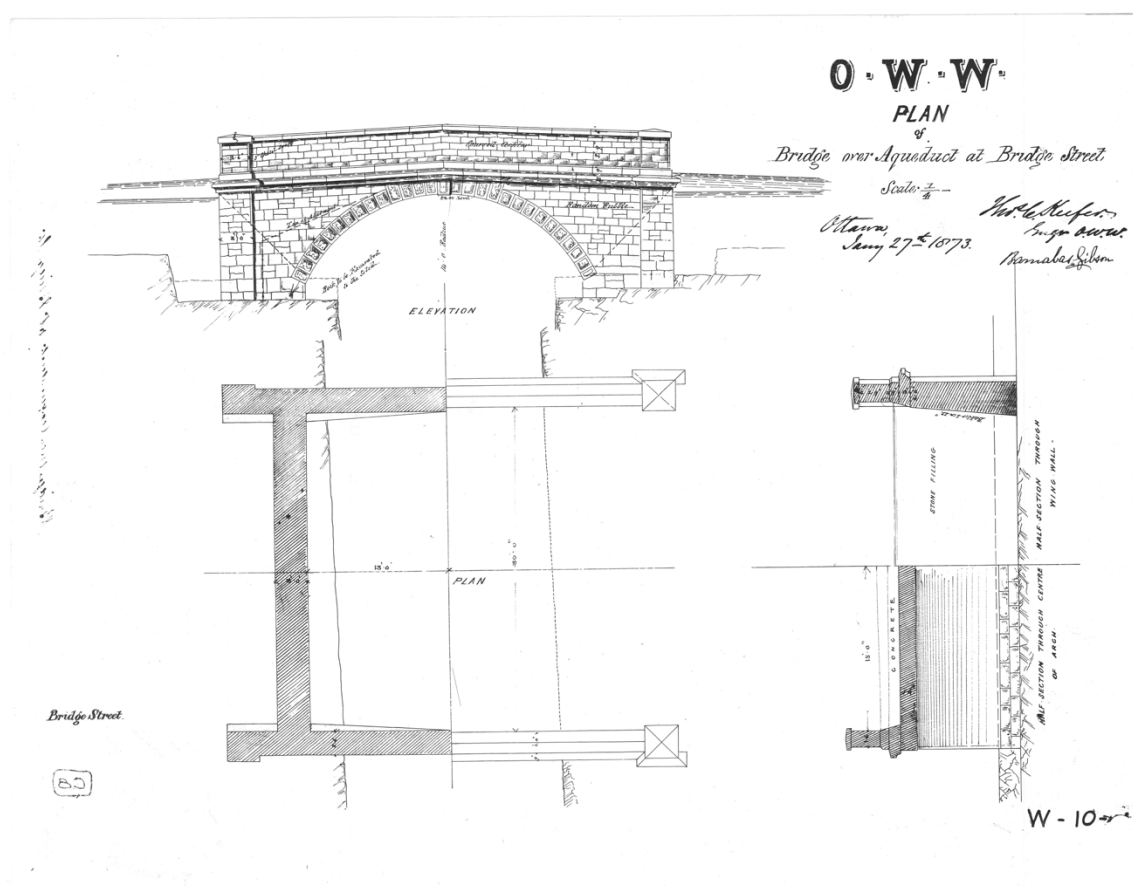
Plan for Bridge over Aqueduct at Bridge Street dated January 27, 1873
